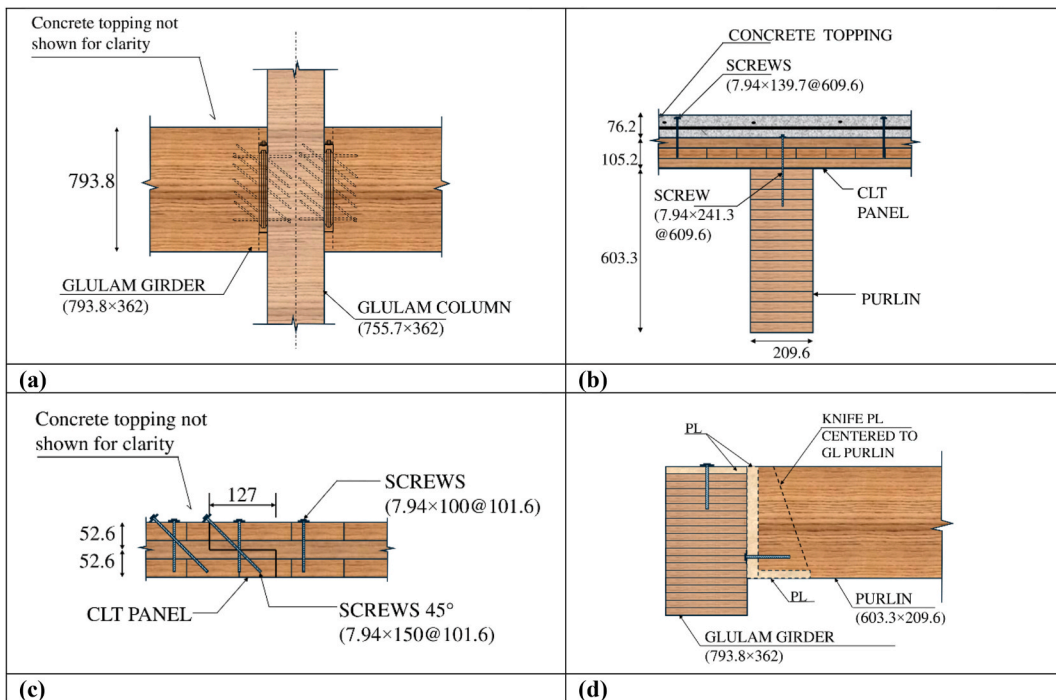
Typical connections between different parts of the floor (a) Glulam girder (beam)-to-column connection, (b) CLT-to-Glulam beam and Concrete-to-CLT connection, (c) CLT-to-CLT connection, and (d) purlin-to-girder (beam-to-beam) connection. All dimensions are in mm.
